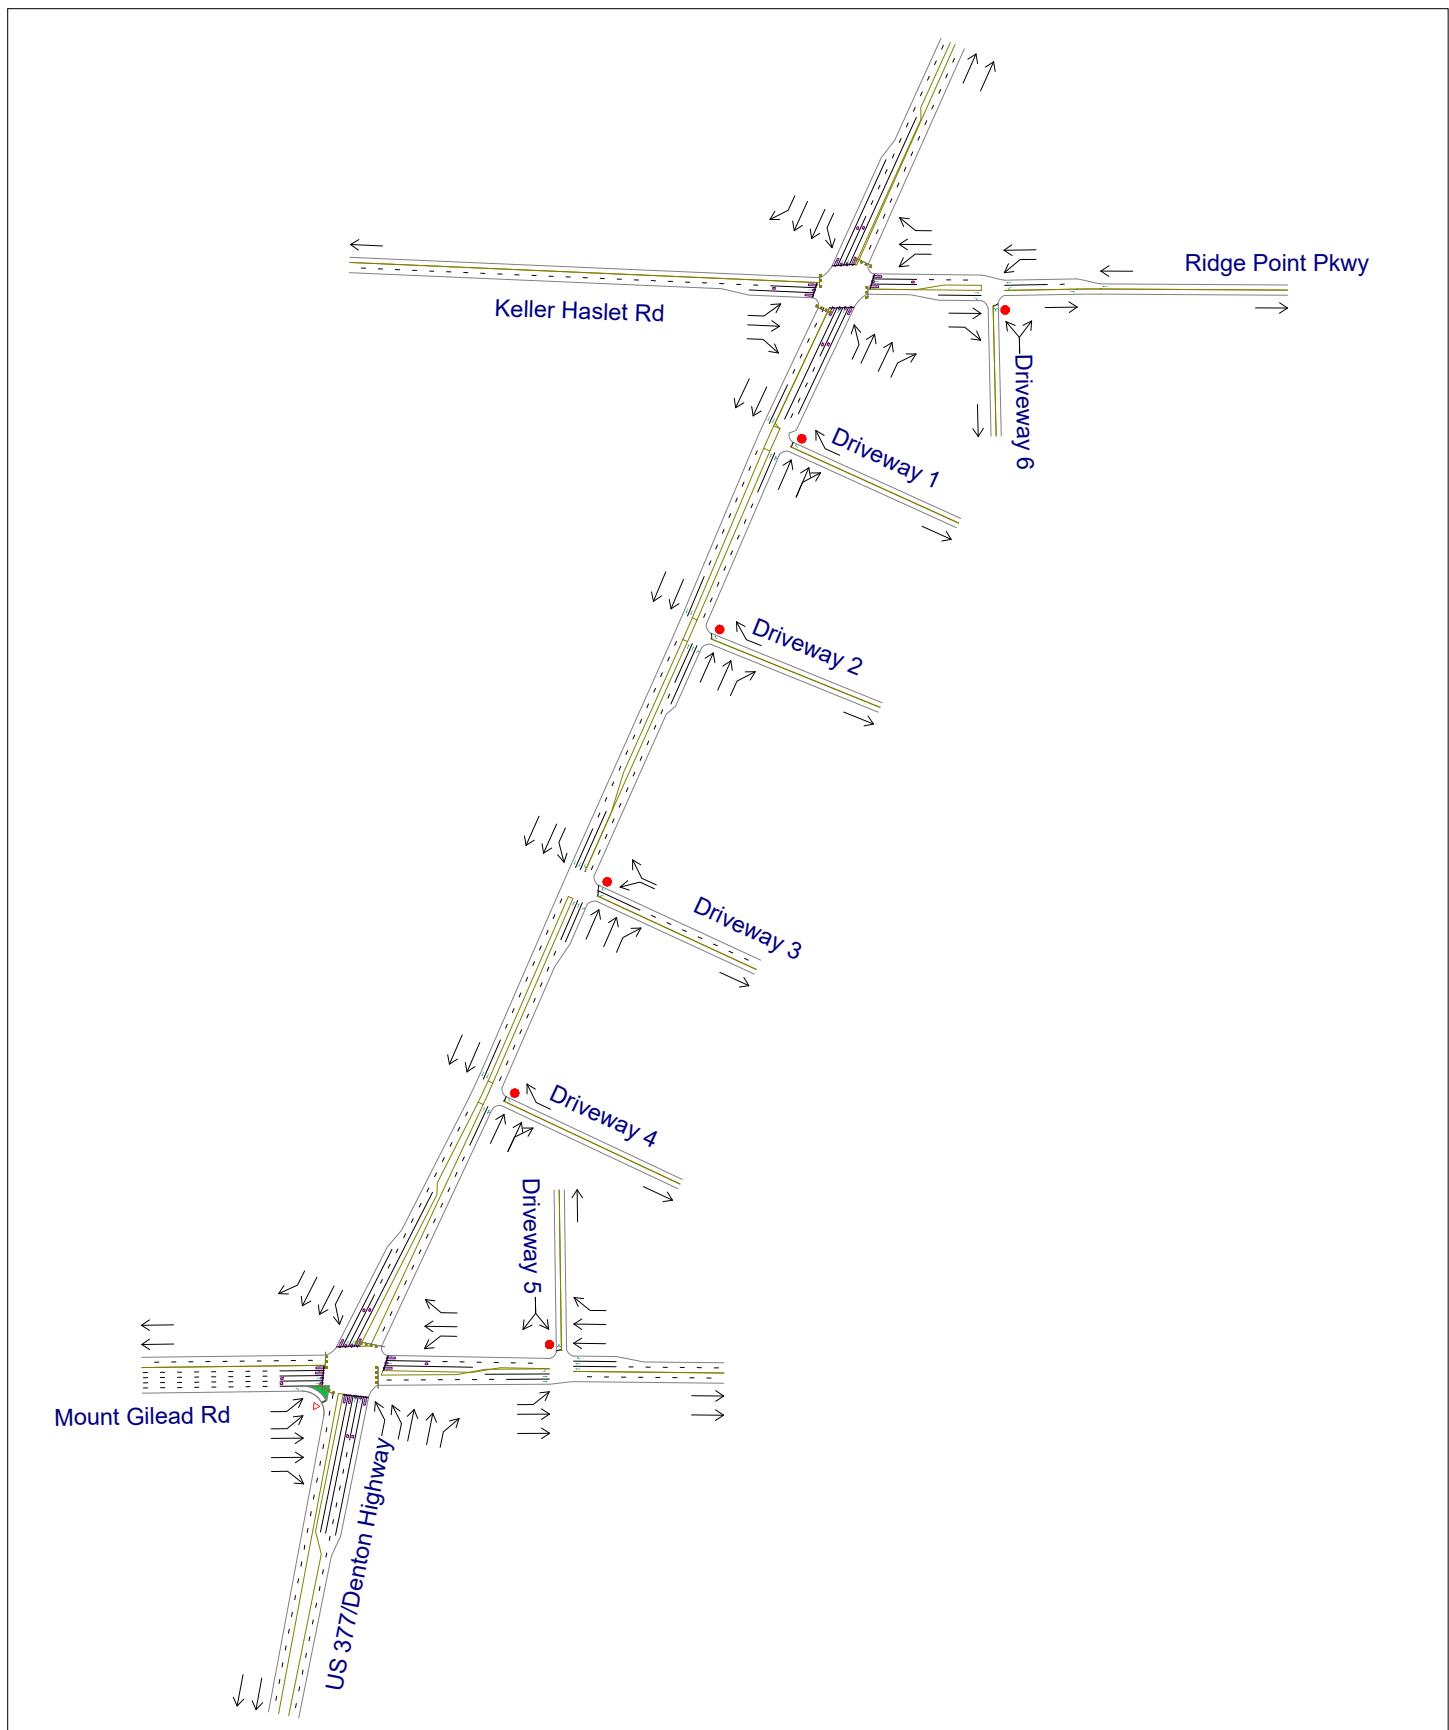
A. 2025 Proposed Roadway Geometry and Traffic Control
